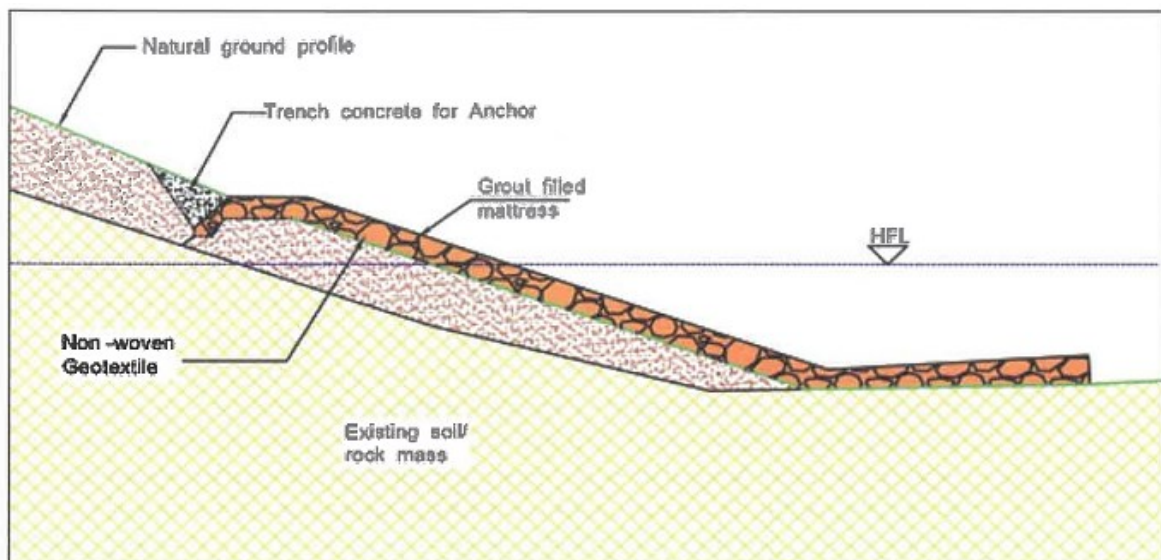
Cross-section of Reinforced Soil Slope with Flexible Facing
